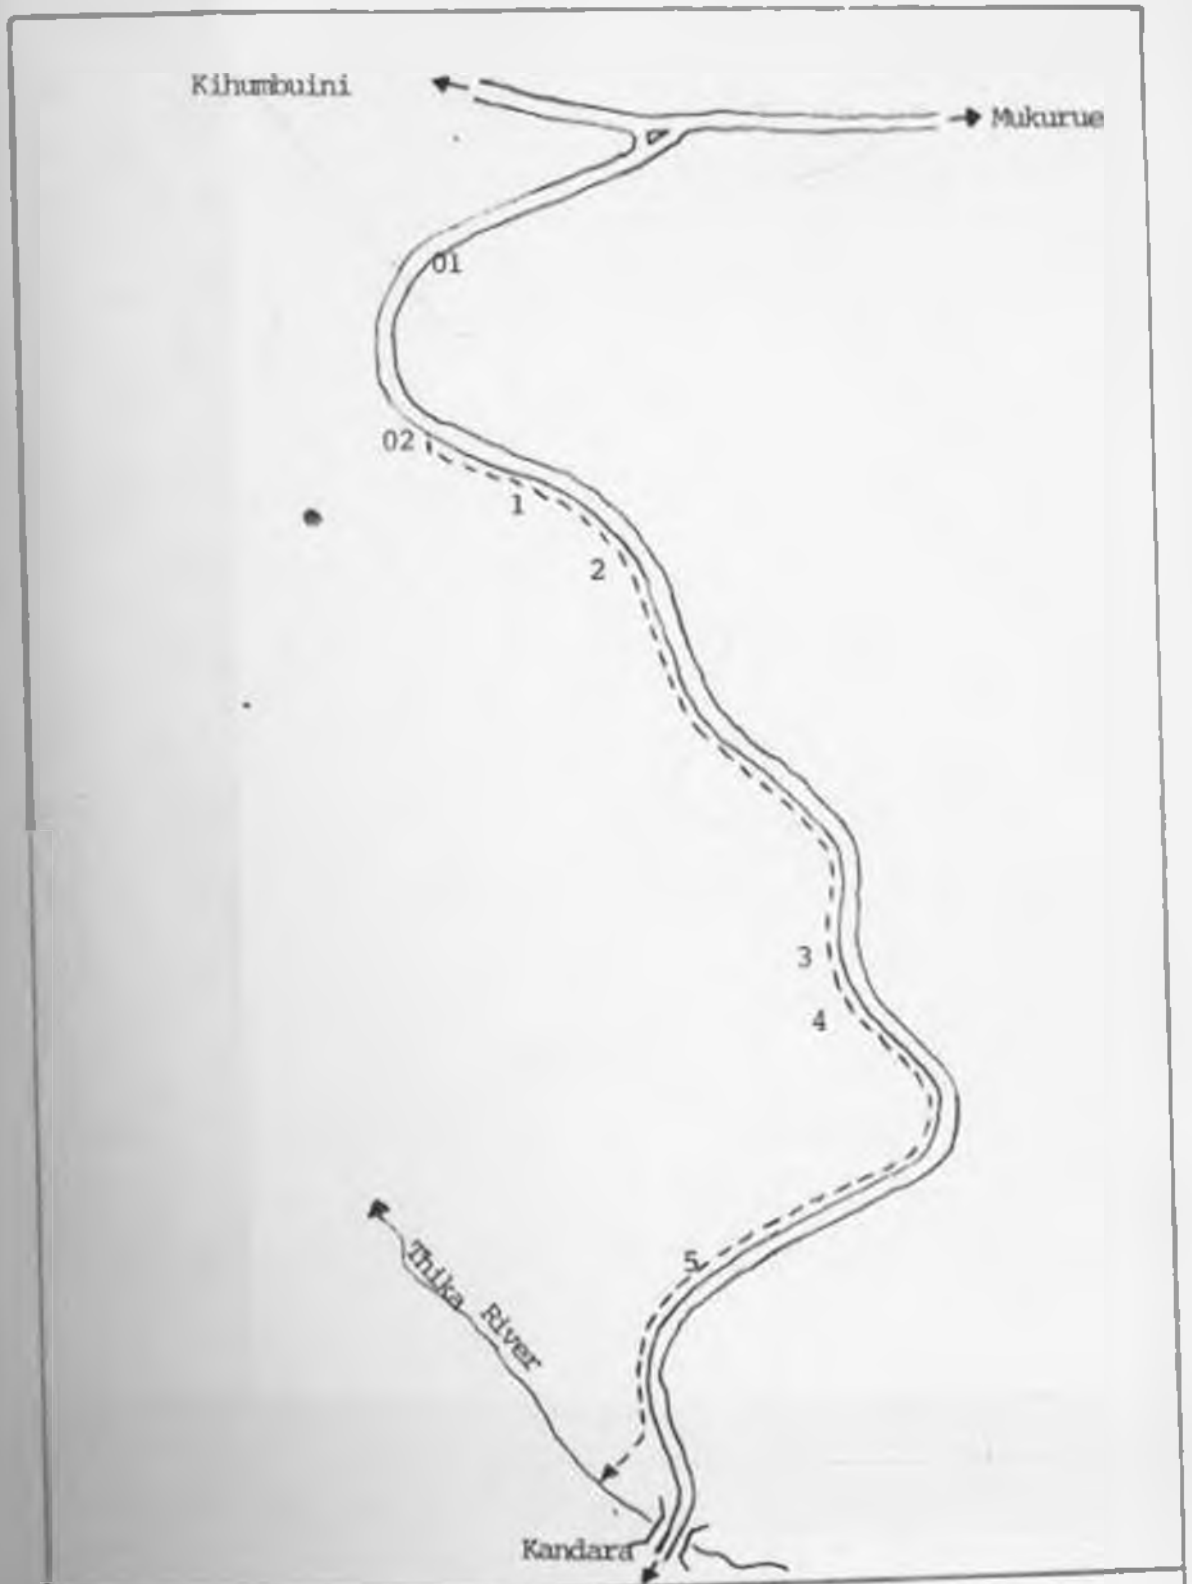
(b). Sketch map of the project site at Kandara, showing position of cross culverts, wooden bridges and gully
